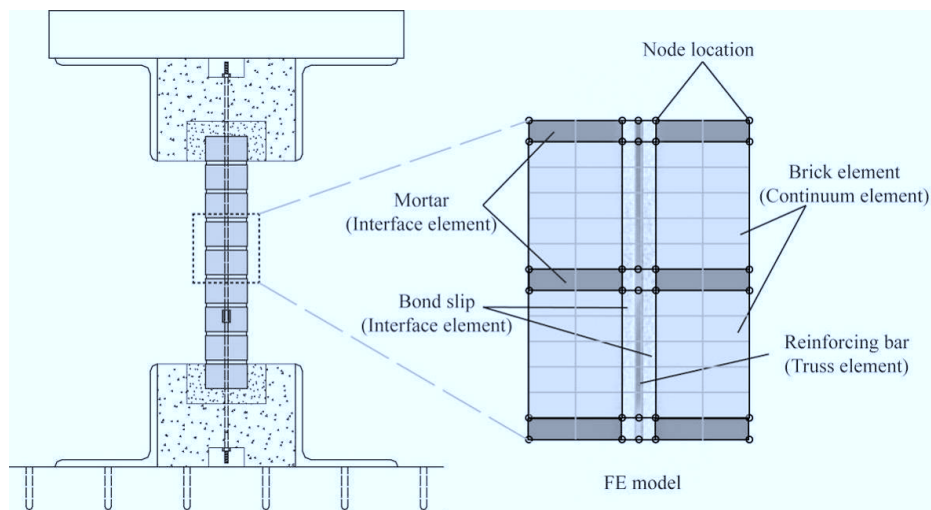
FE mesh showing the brick unit, mortar interface, bond slip interface and reinforcing truss element bar.
